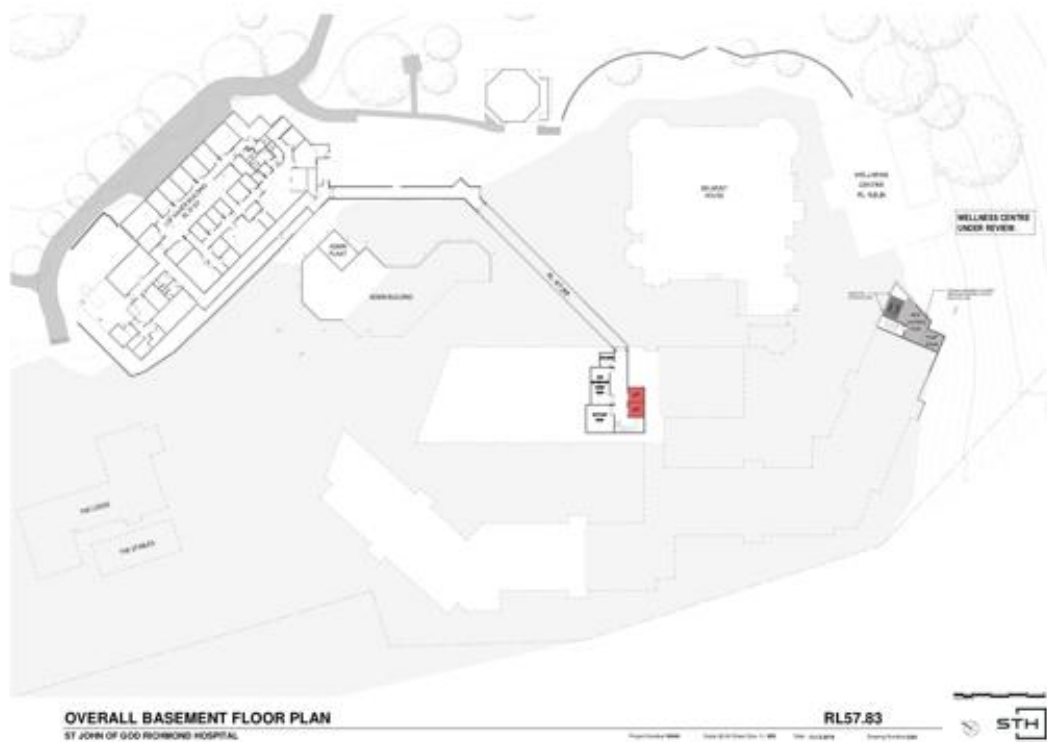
Basement Floor Plan. Underground walkway between Xavier Building and proposed buildings. Silver Thomas Hanley. 2019.
